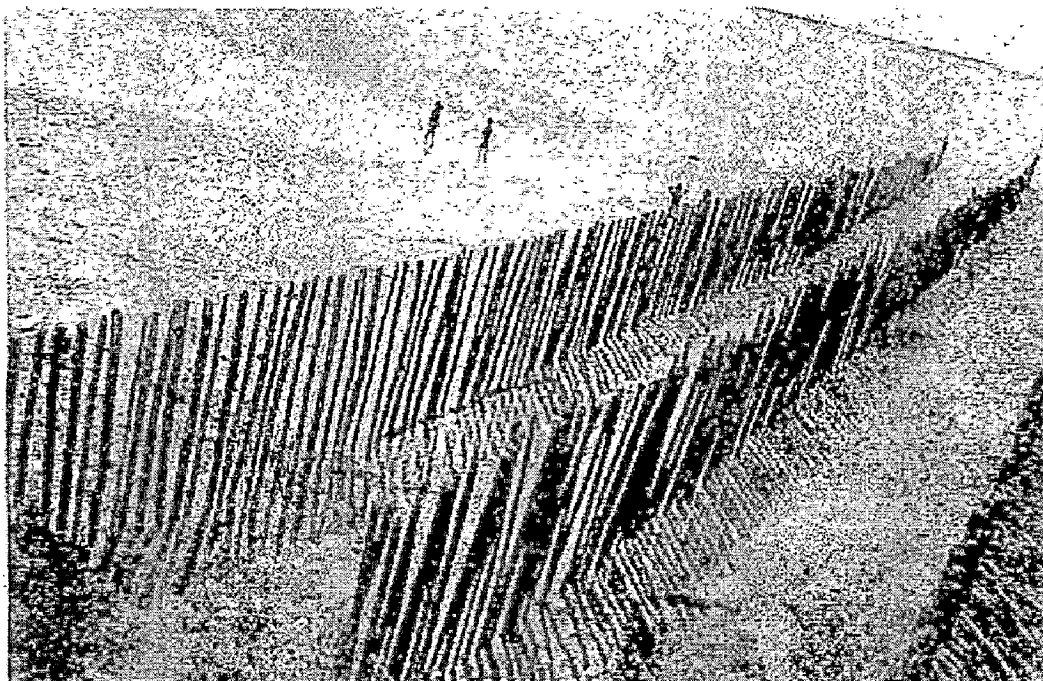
PERMEABLE SPURS AT GUMI ASSAM
